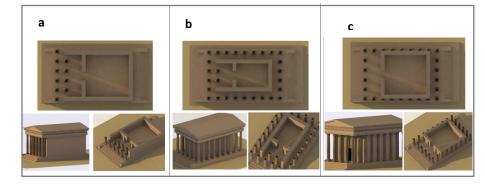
Potential restitutions of temple: a- Prostylos layout, section drawings and renders bperipteros layout section drawings and renders cpseudoperipteros layout, section drawings and renders.
